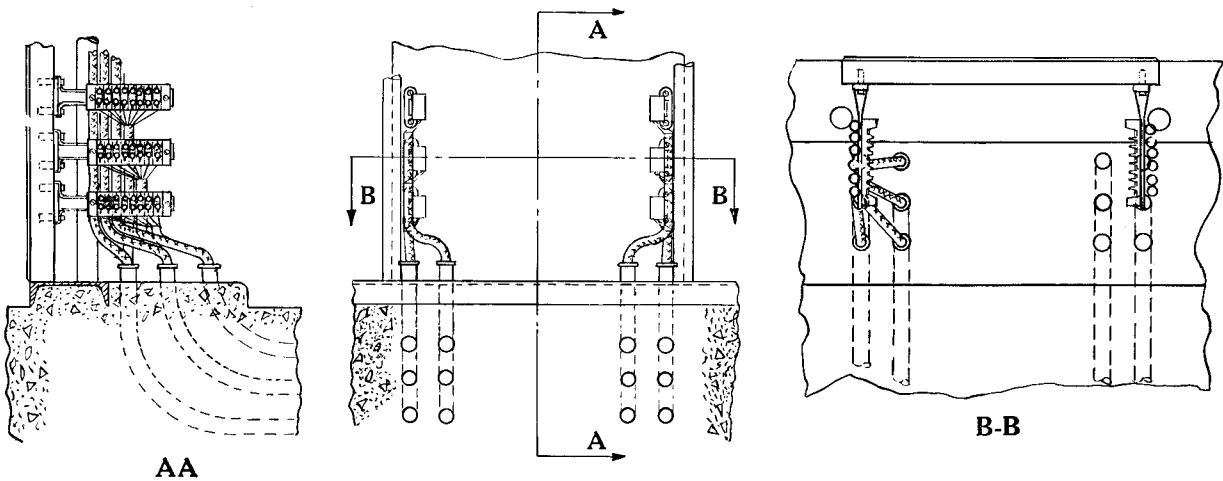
In this arrangement all conduits are laid in concrete. Note particularly the method of mounting terminal boards in order that the maximum accessible space on the rear will be obtained. (Pipe frame switchboard shown).
